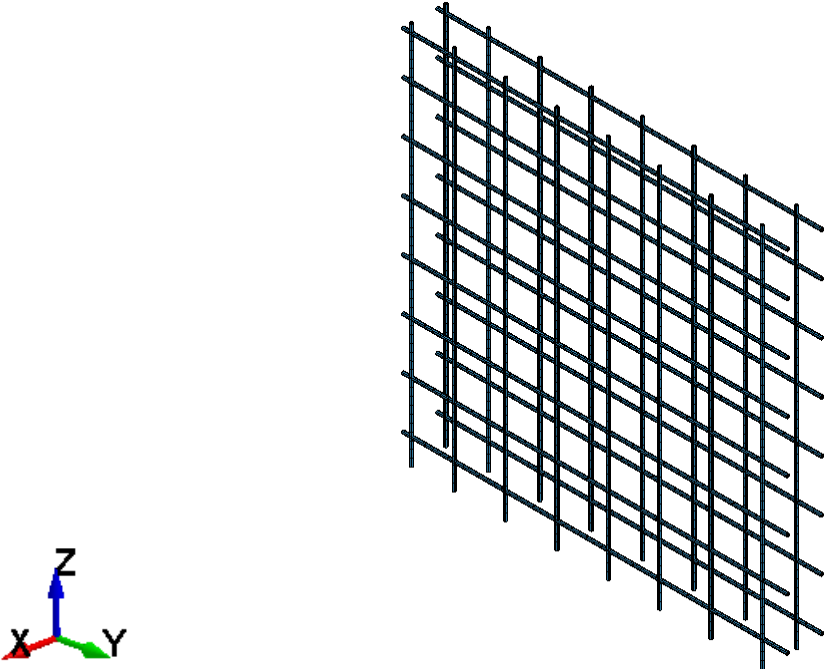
Rebar layout, 12-inch panel, Lagrangian model
